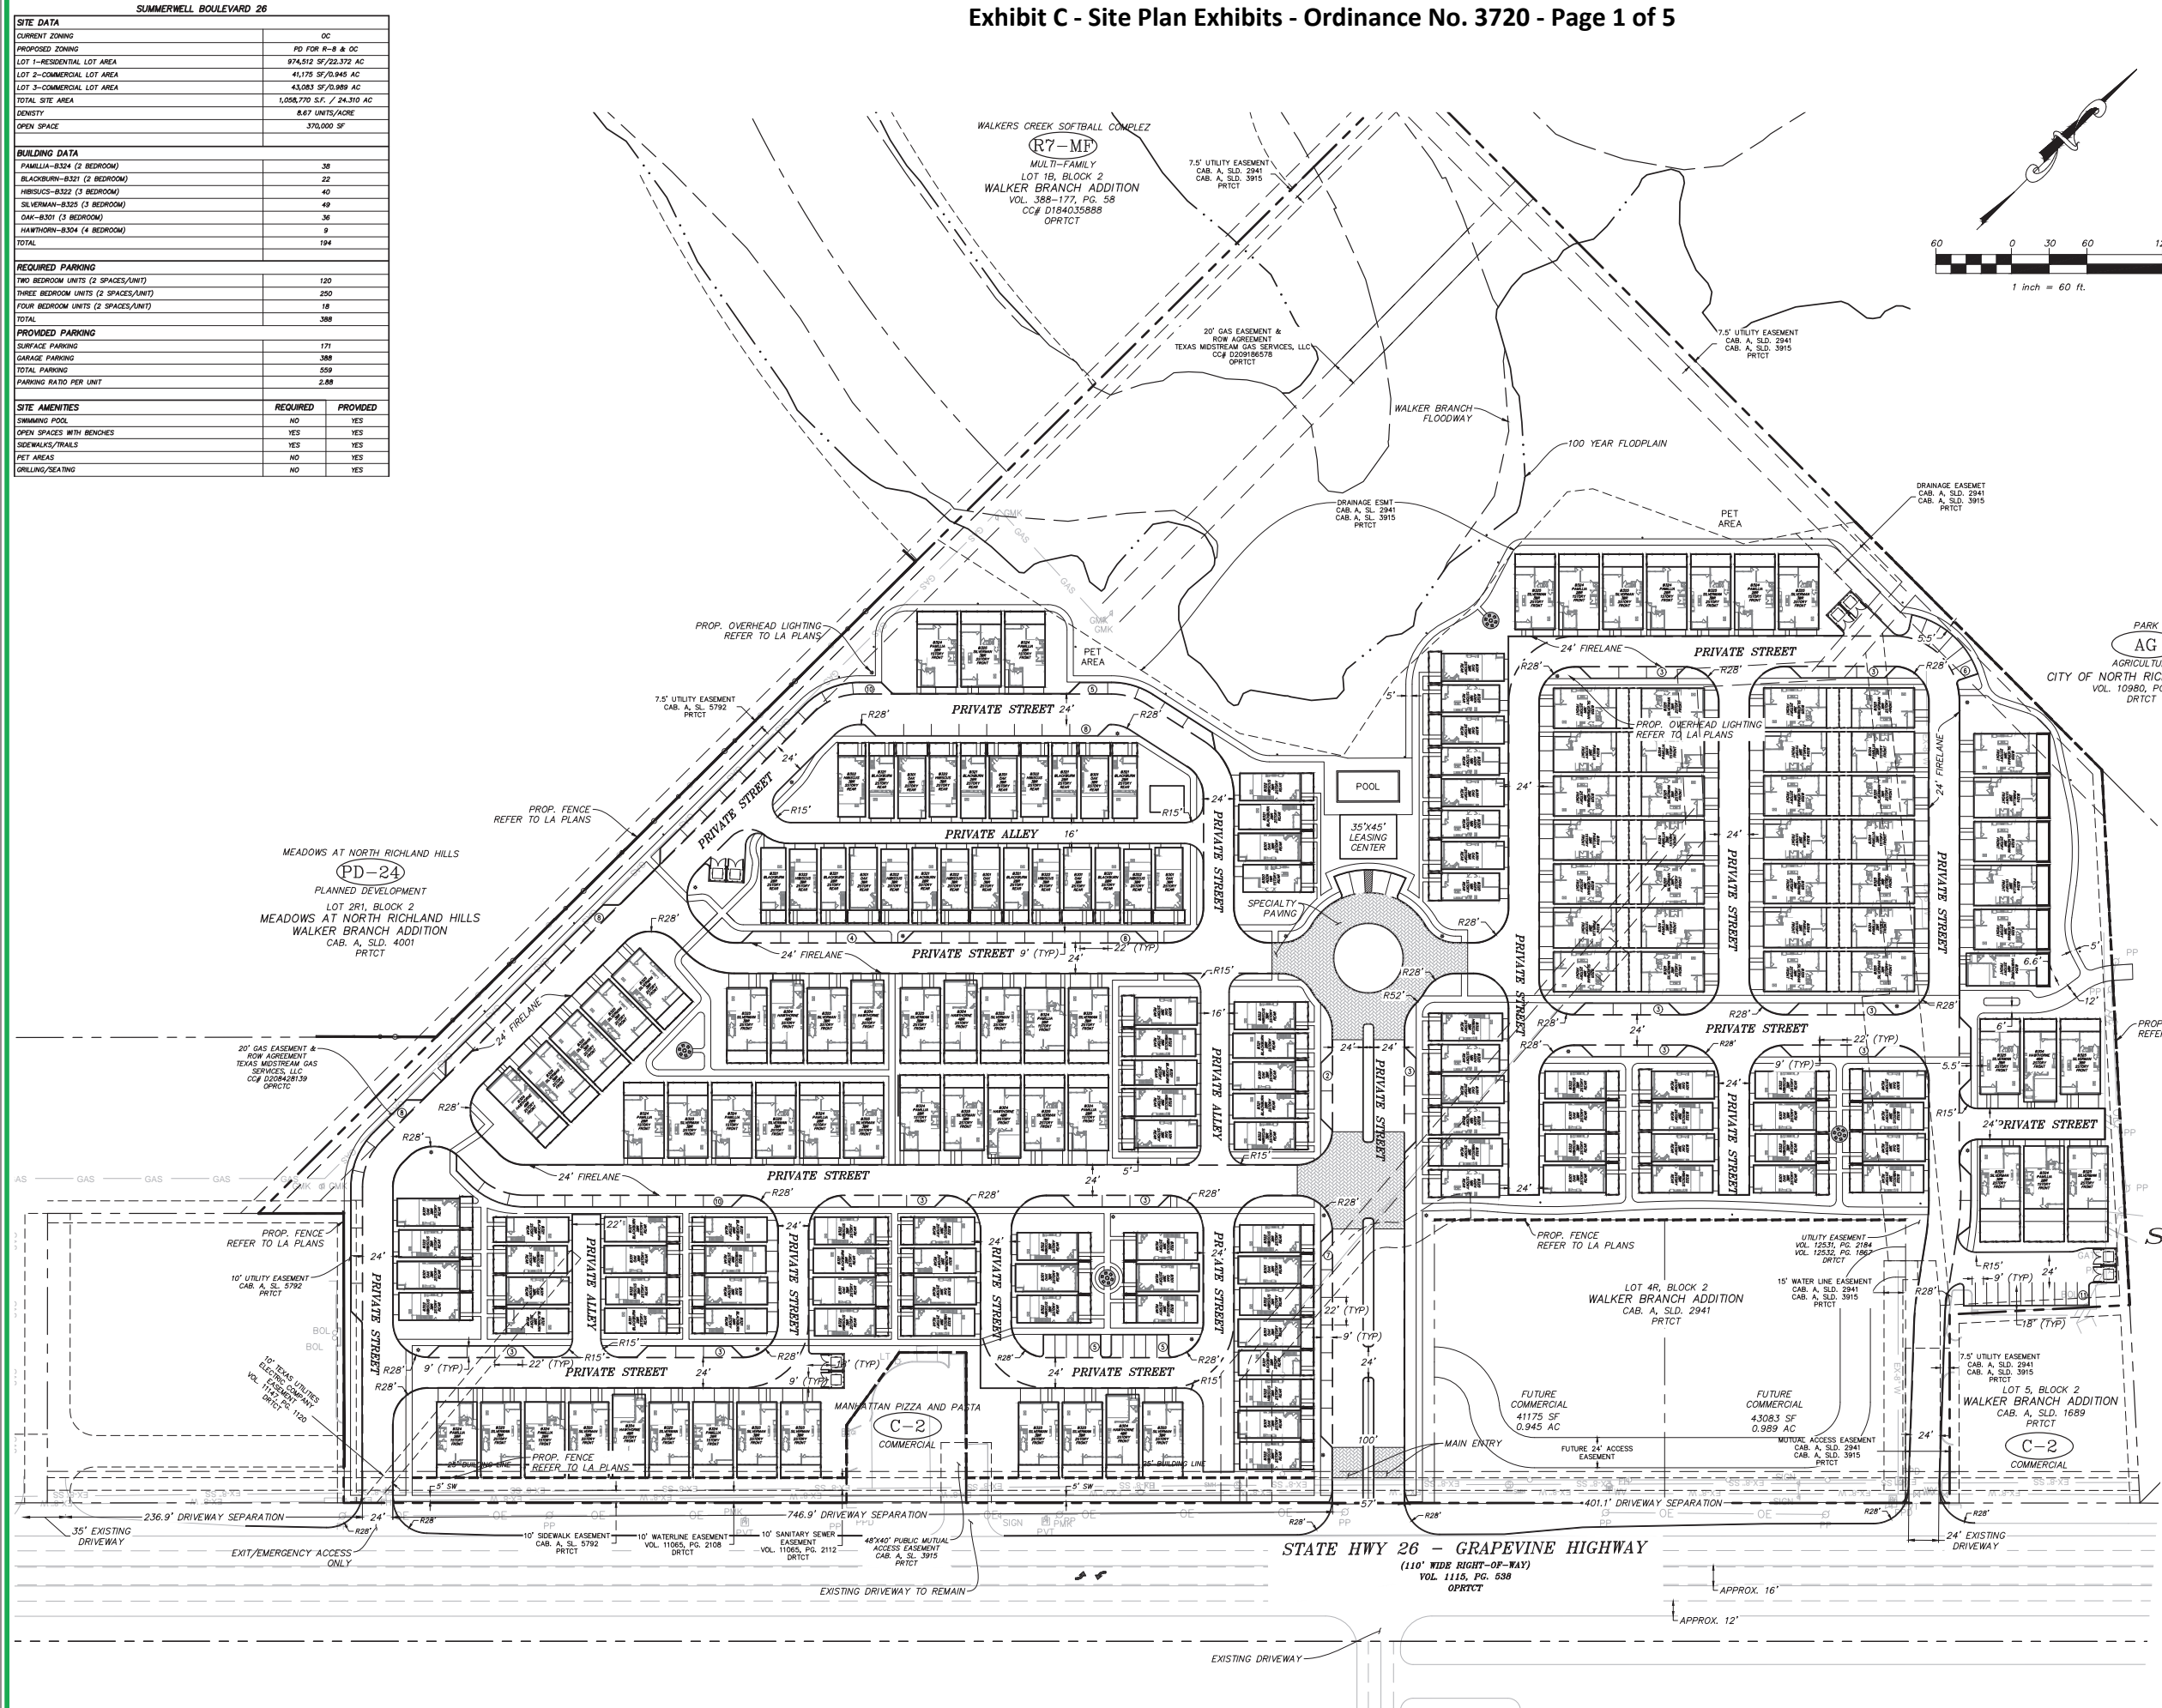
Exhibit C - Site Plan Exhibits - Ordinance No. 3720 - Page 1 of 5
